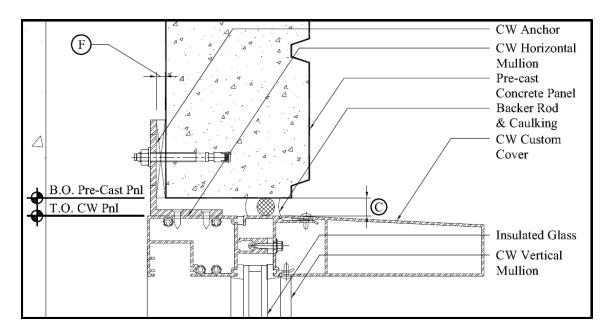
Detail 1: head of the curtain wall panel. Refer to Figure 9. Letter F indicates the distance between the curtain wall anchor clip and the precast panel, and letter C the distance between the top of the curtain wall and the bottom of the precast panel. Adapted from Diaz, O. (2014).
